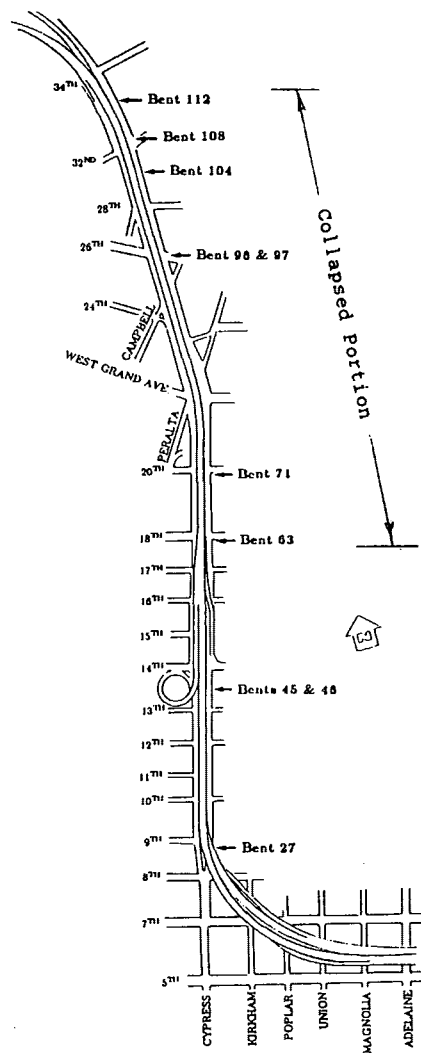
Plan view of Cypress Street viaduct showing collapsed portion (1).
